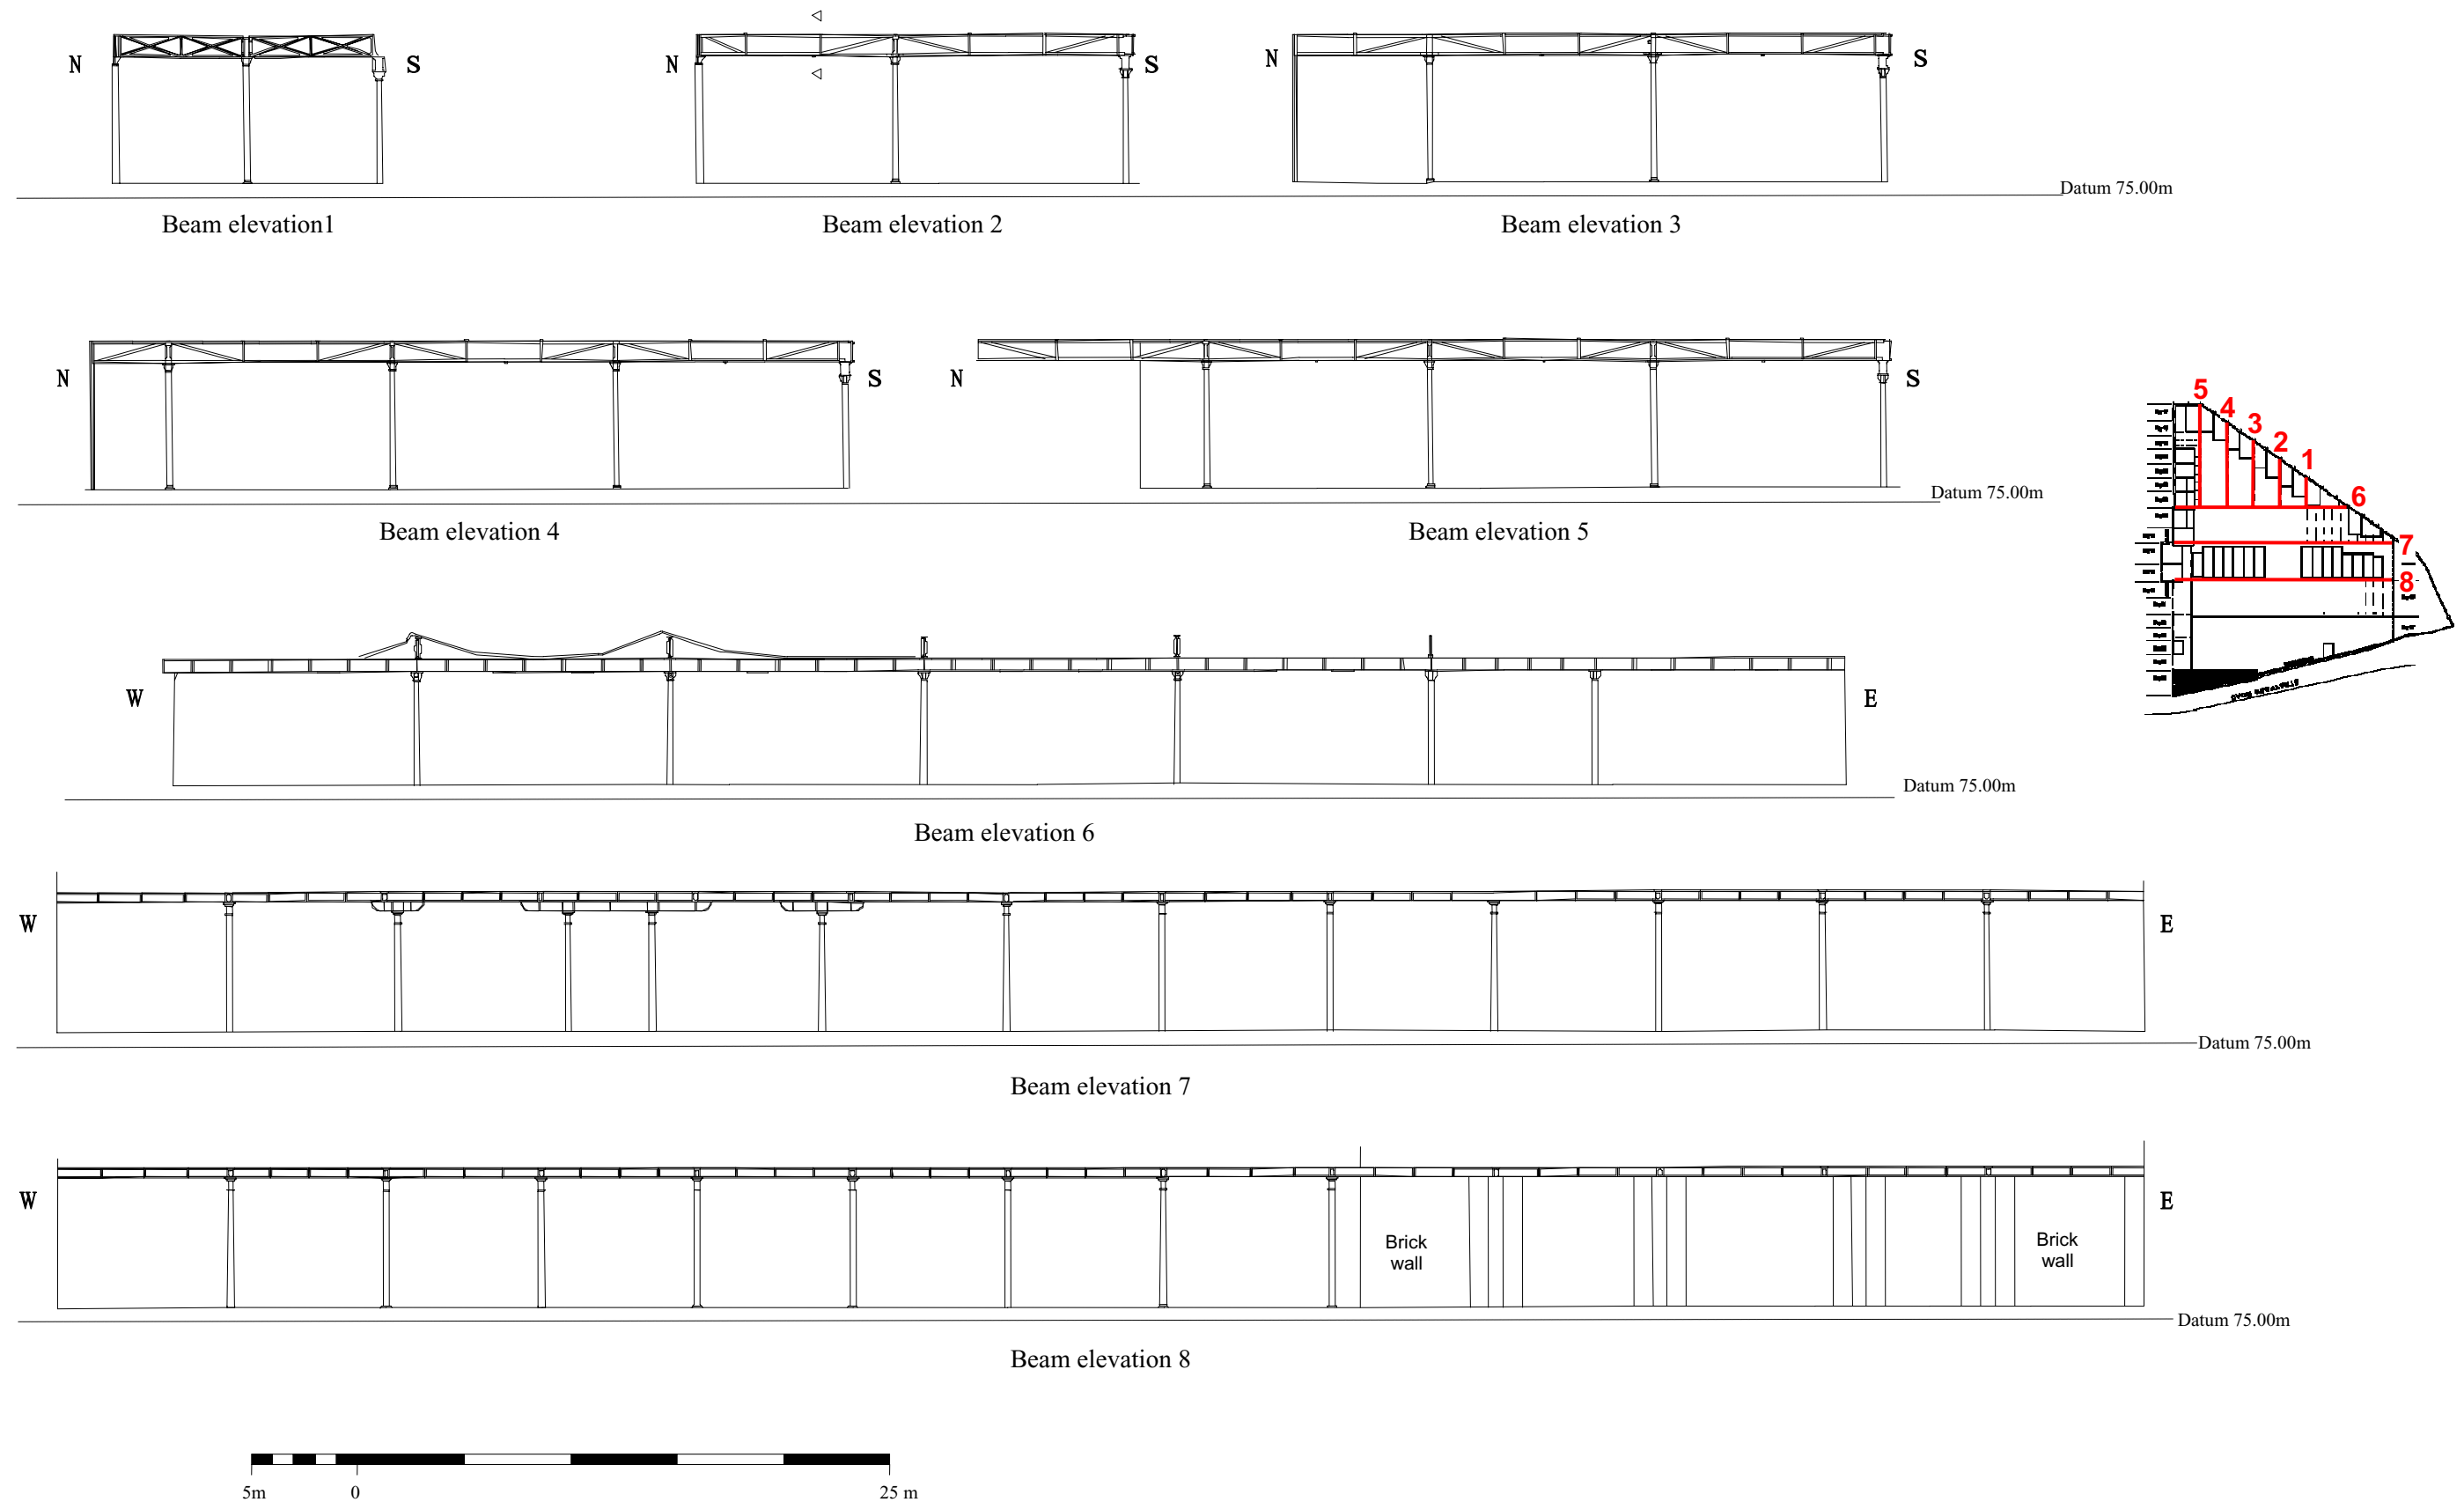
Triangular Building beam elevations (based on drawings supplied by client Wilmott Dixon).
